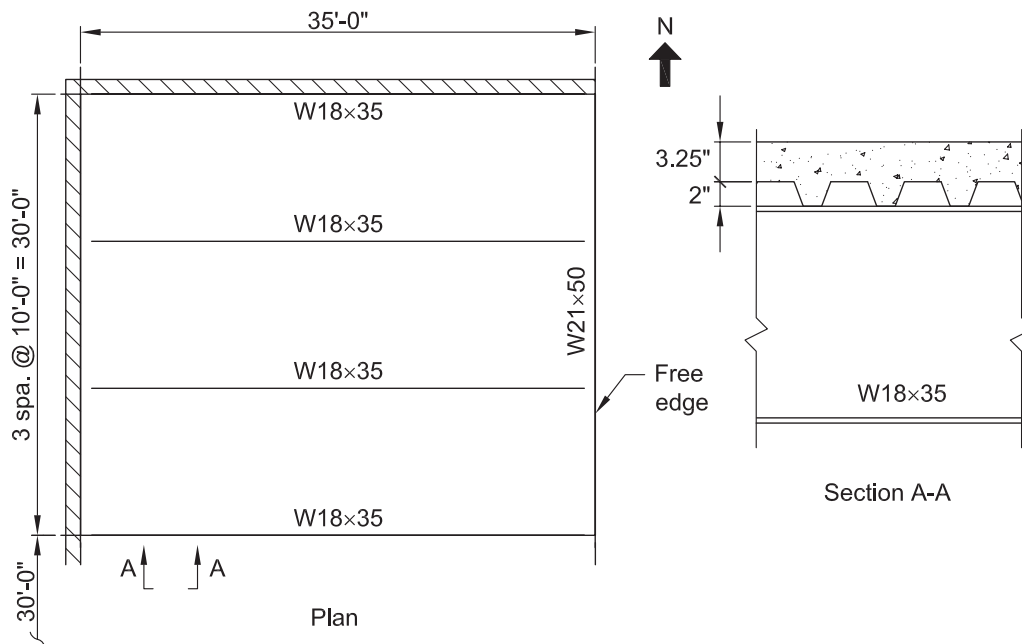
Mezzanine with girder edge member framing details for Example 4.4.
